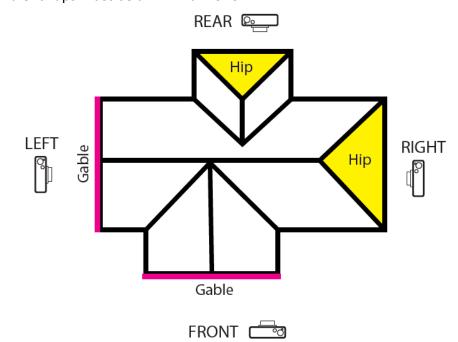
Minimum photograph requirement and locations (Front, Rear, Left and Right).
